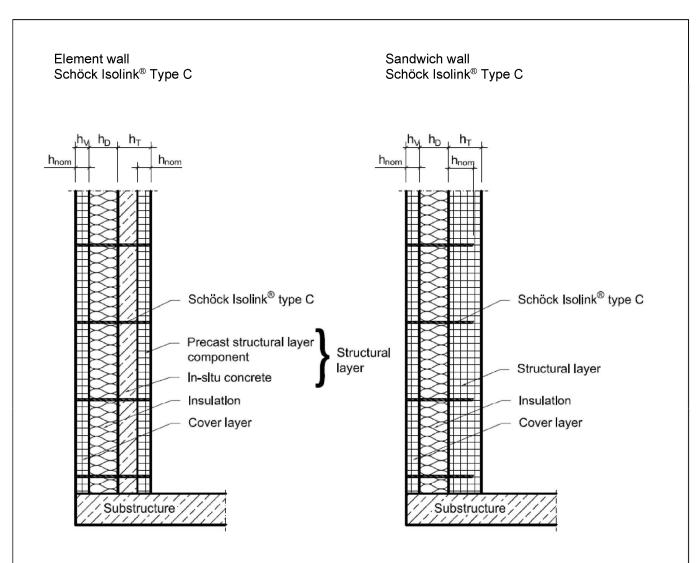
Schöck Isolink® type C Wall with non-supported cover layer
